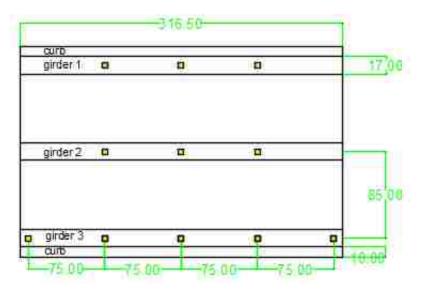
Span 4 Prism Layout (Dimensions shown in inches, 1 in. = 25.4 mm)
